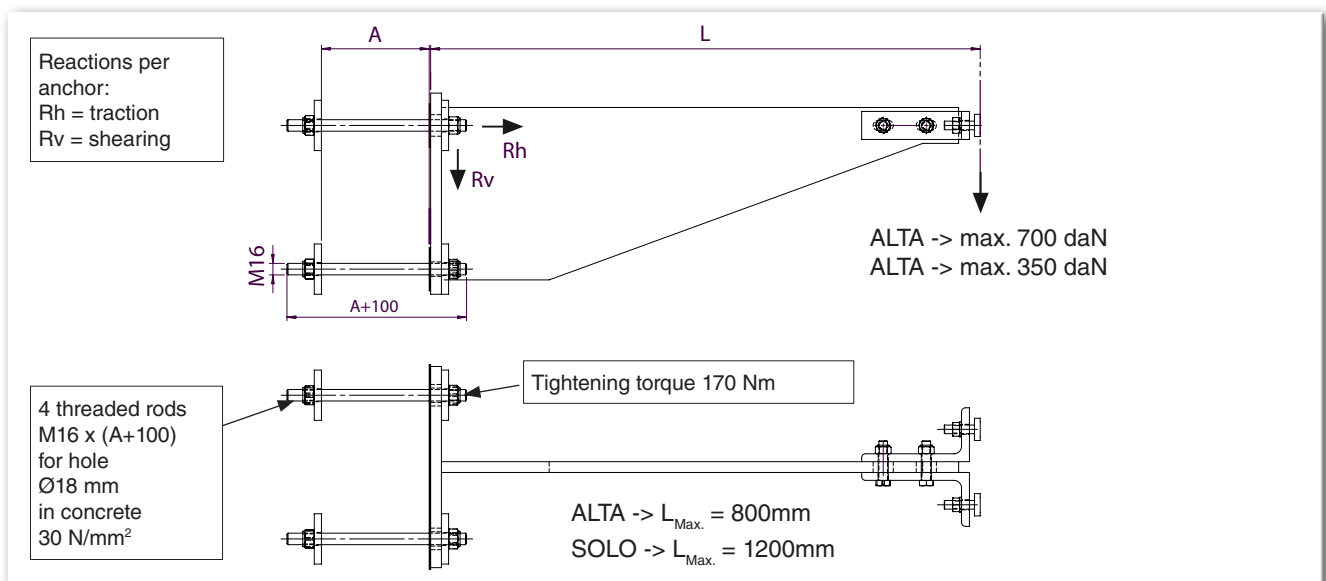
RAILSCAF™ bracket with four threaded rods
